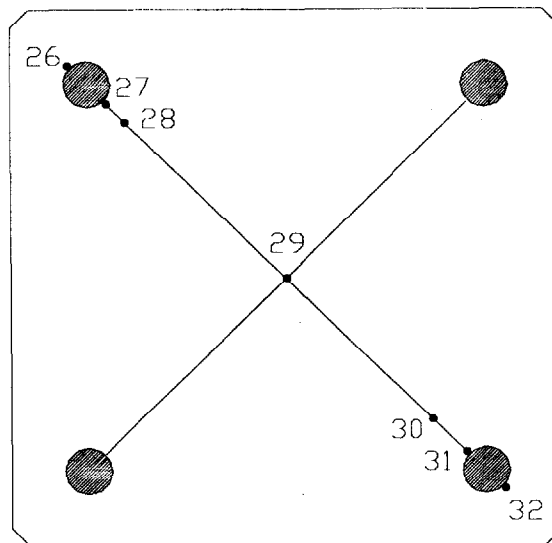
Position of thermocouples in the cross section. Sections without stirrups, 7 thermocouples per cross section
